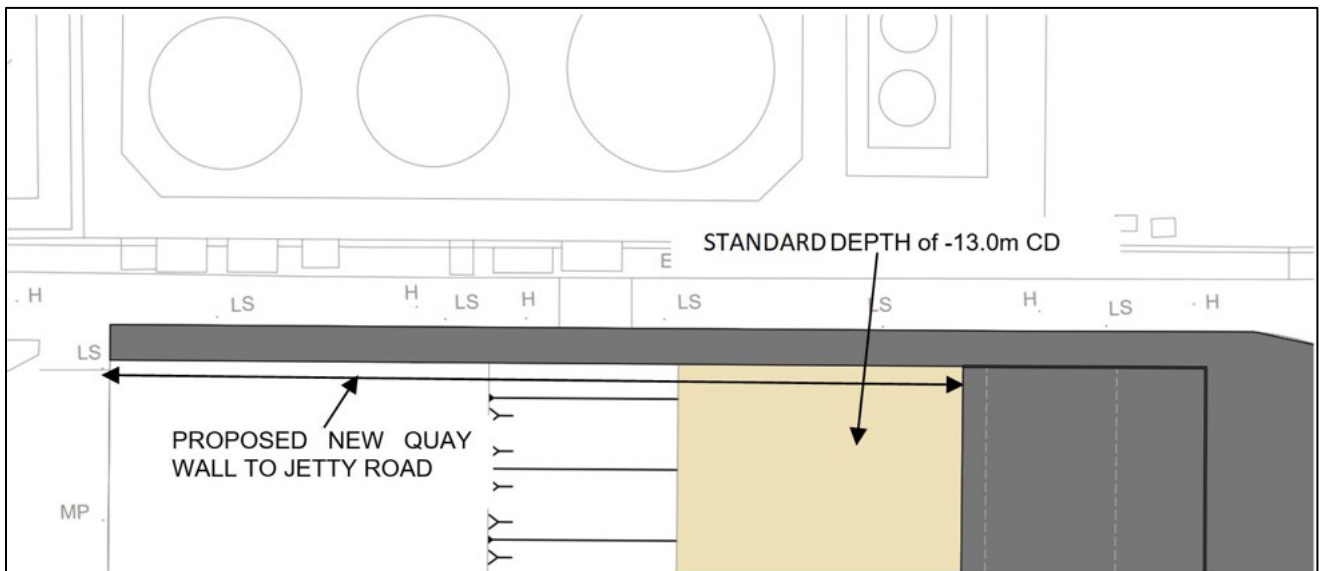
Plan of proposed Jetty Road Quay Wall
